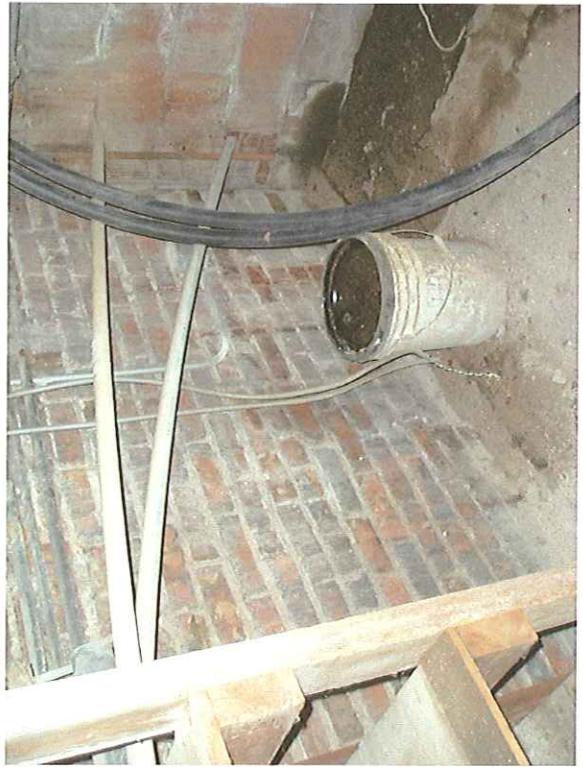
Container of waste oil (presumed) in maintenance storage area adjoining old boiler room (Room 3).
